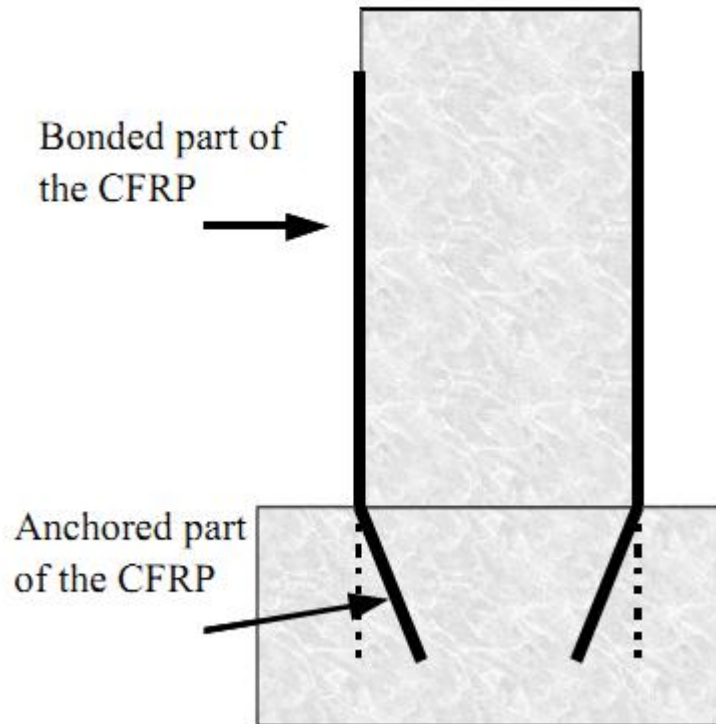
Anchoring principle of the flexural retrofitting of the column (Sadone et al., 2012)
